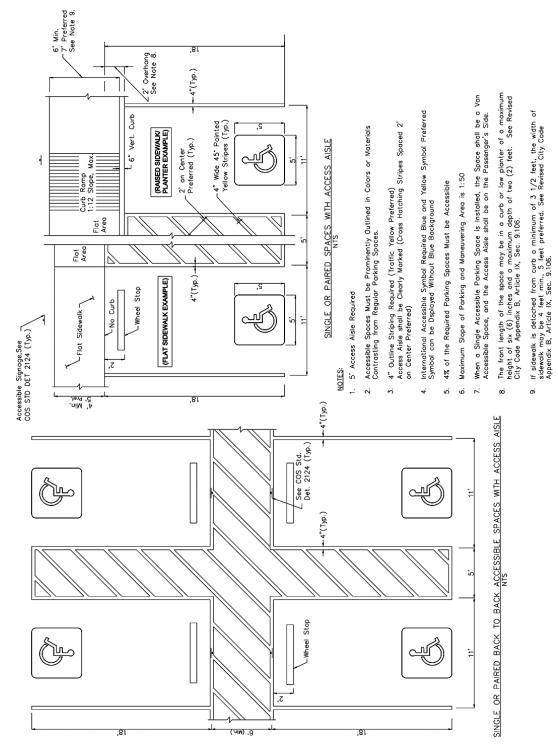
PREFERRED ACCESSIBLE PARKING SPACE
